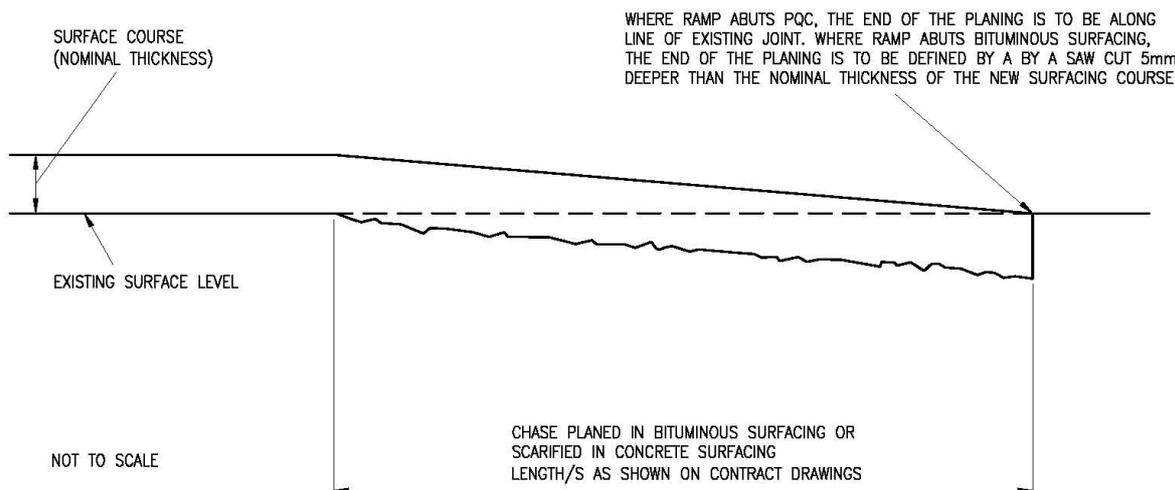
Ramps between Surface Course and Existing Pavements
